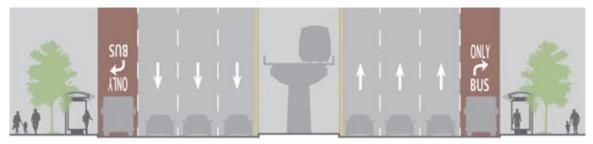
| Alternative 3 cross-section of Tyco Road from Route 7 to Spring Hill Road
